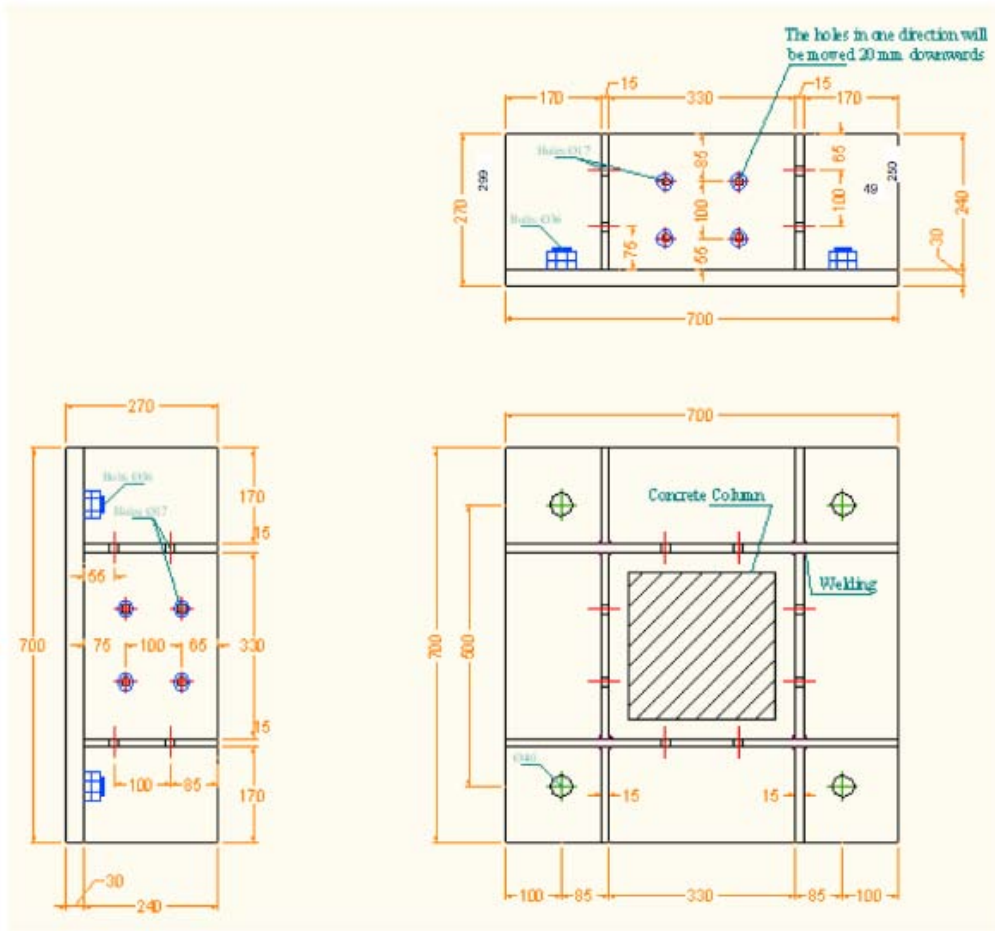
BANDIT specimen steel footing (Unit: mm), (Garcia et al. 2012)
